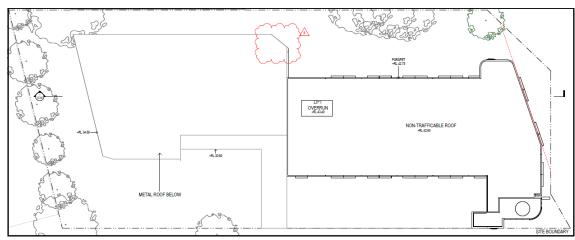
Previous hotel roof plan (DA-102, Issue D)
